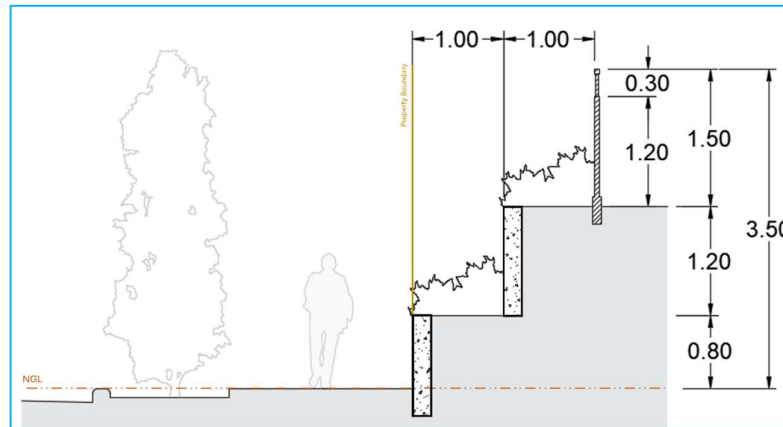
(b) c Retaining wall and fence height - two steps
